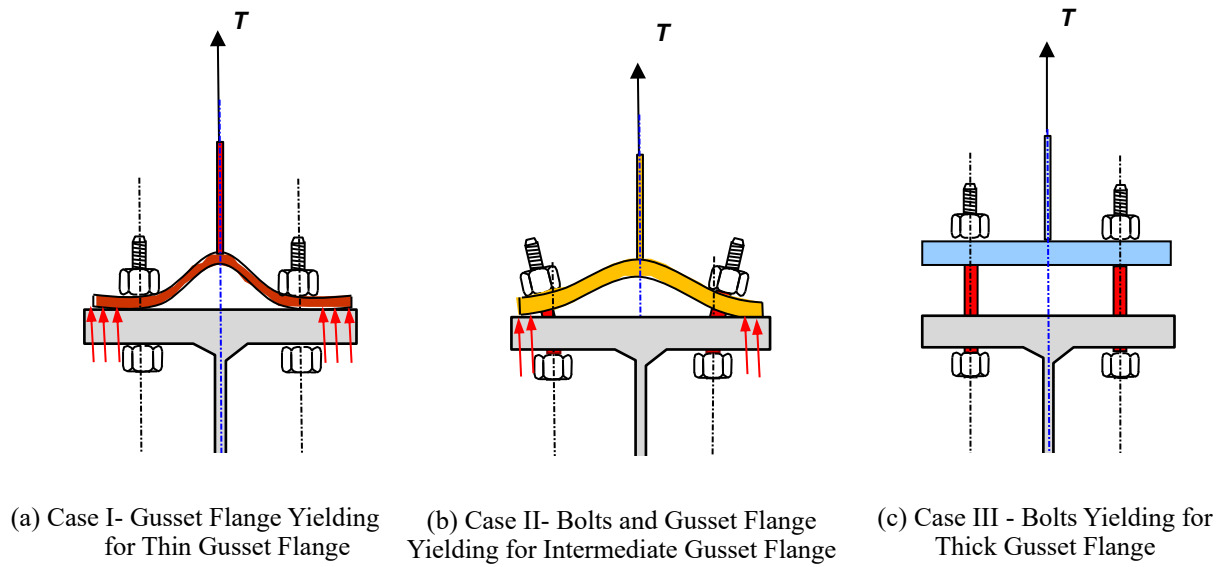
Possible failure modes of the gusset flange connection similar to T-hanger connections
